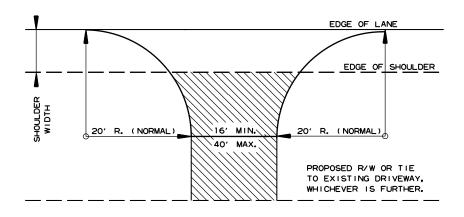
DETAIL FOR COUNTY ROAD TURNOUTS OPEN SHOULDER SECTION
